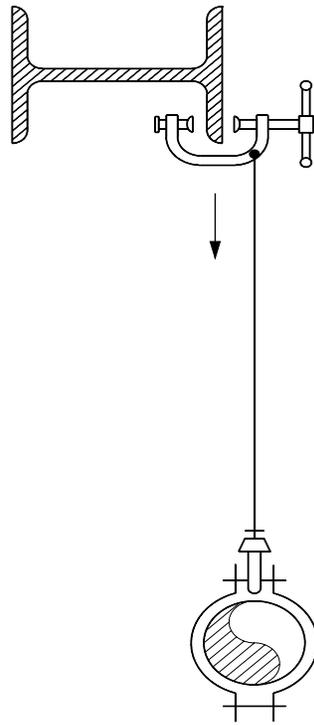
C-Clamp Relies on Friction, May Slide
